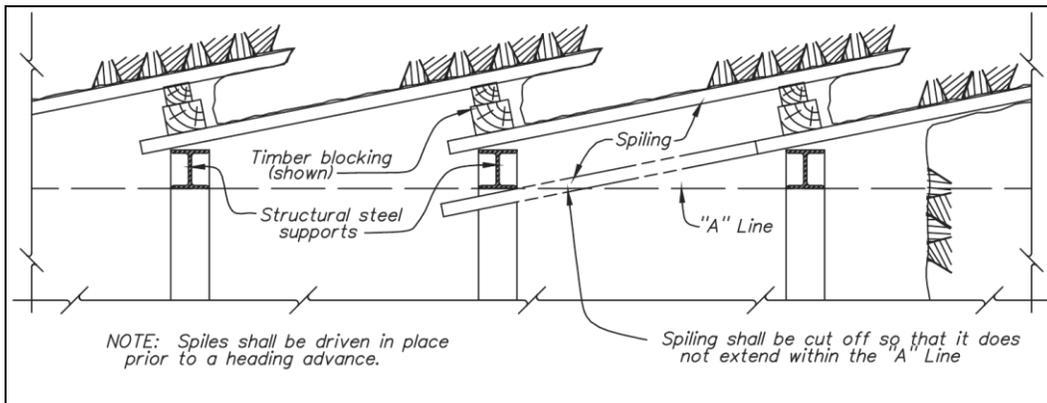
Drill and blast excavation using spiles.
